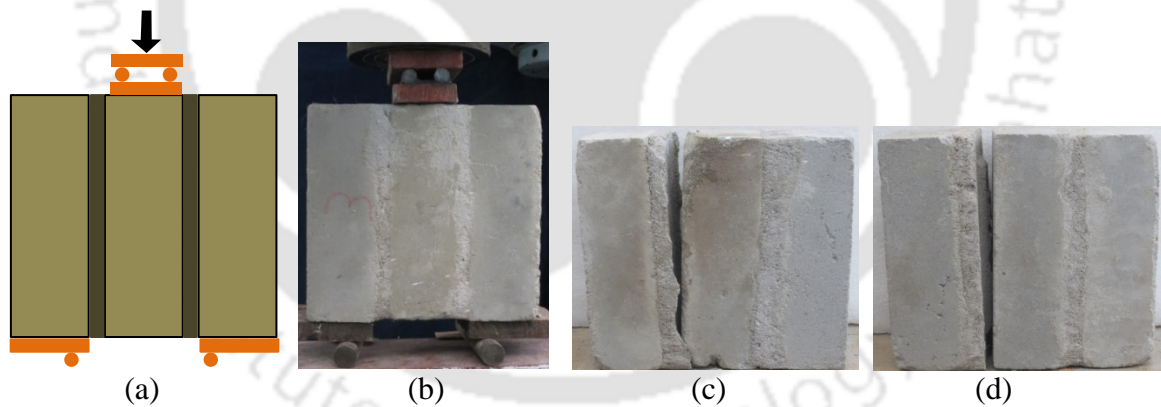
Initial bed joint shear test setup (a and b); and failure mechanism in fly ash brick masonry triplet (c and d).
